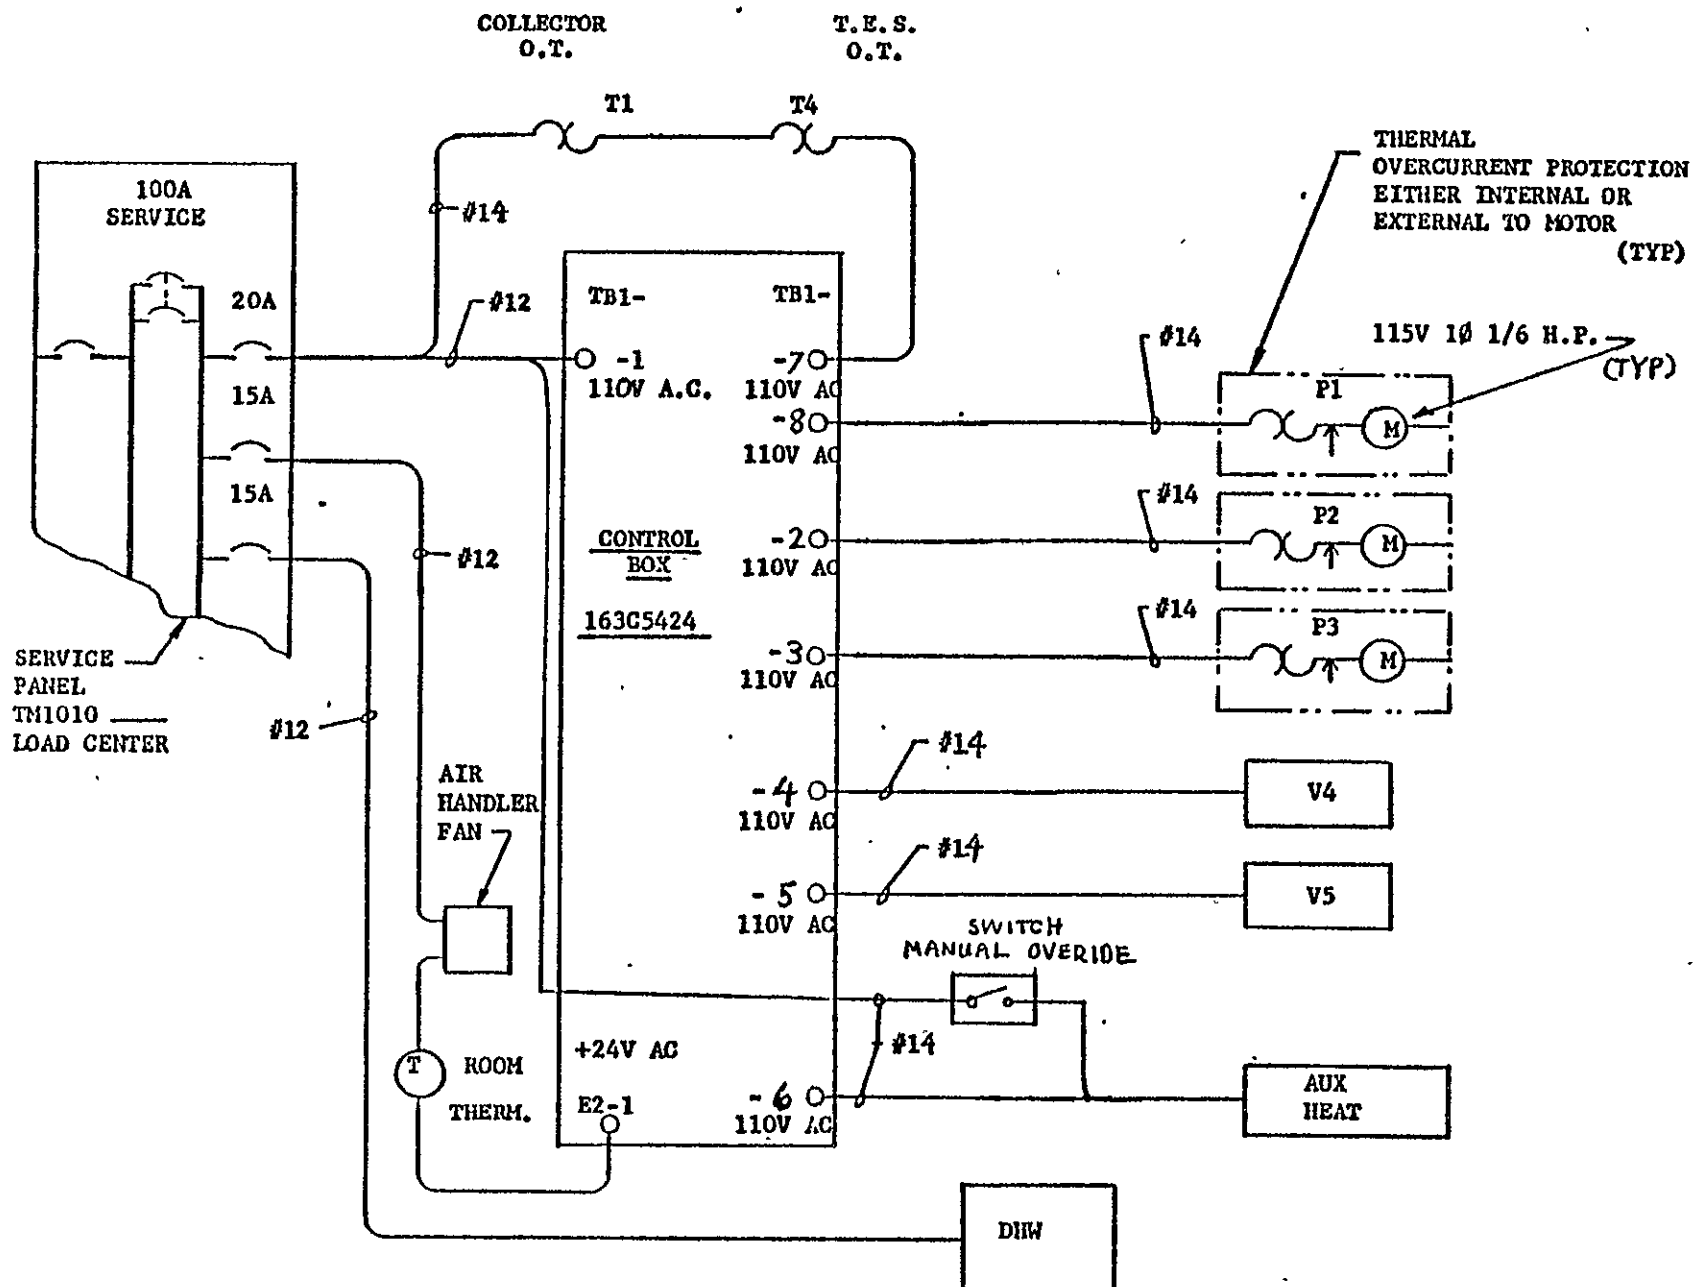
Detailed Electrical Diagram (HSF System)
